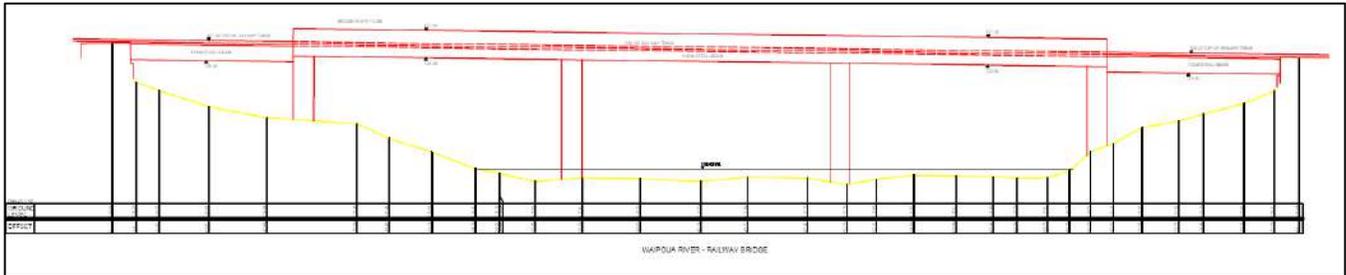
Screen shot from CAD drawing of the Waipoua River Railway Bridge
